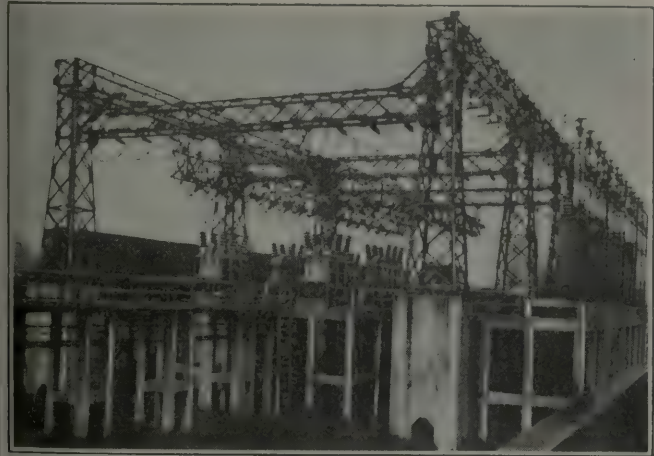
OUTDOOR SUBSTATION AT WINDSOR PLANT
